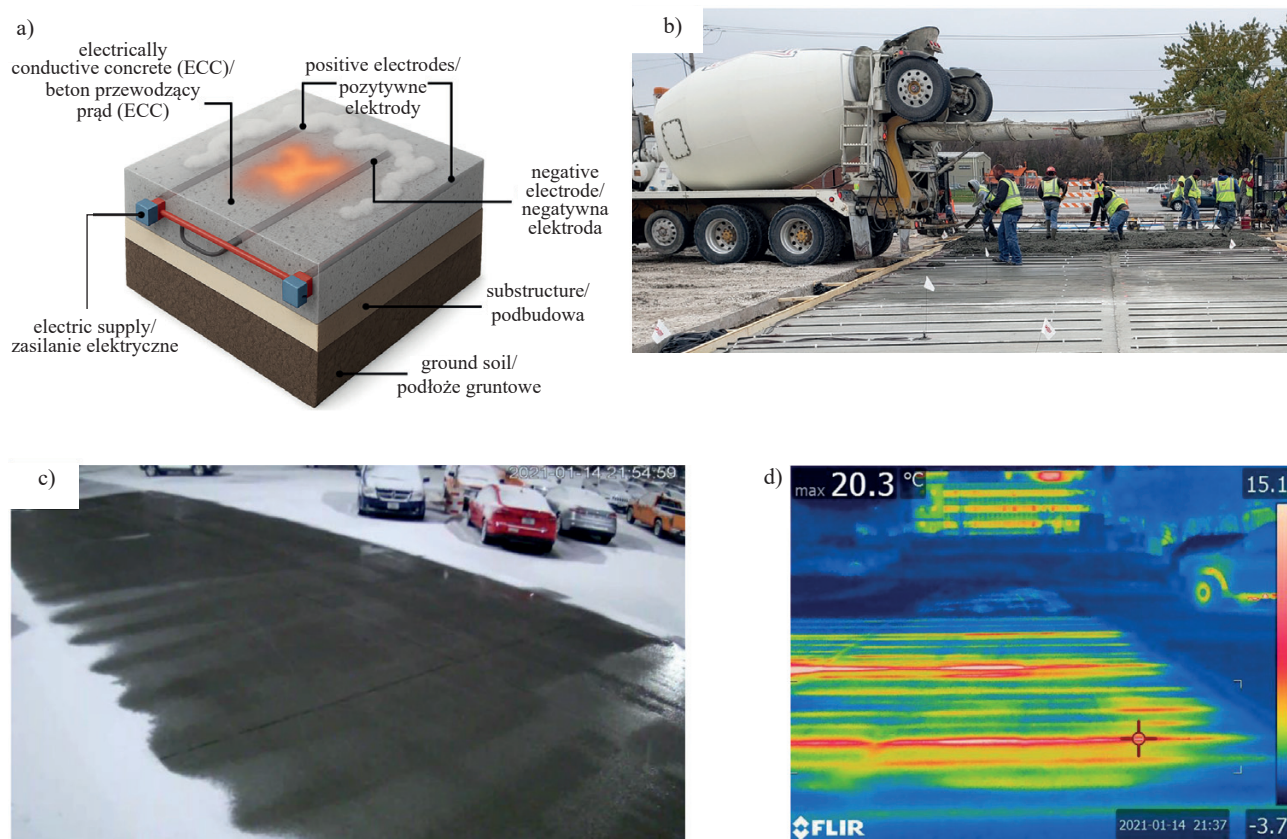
Schematic of a deicing system ECON HPS based on electrically conductive concrete (ECC) with powered electrodes (a); field-scale construction of an ECC pavement (b); surface view of the concrete during deicing test under winter conditions (c); thermographic image of the ECC surface showing uniform slab heating (d)
